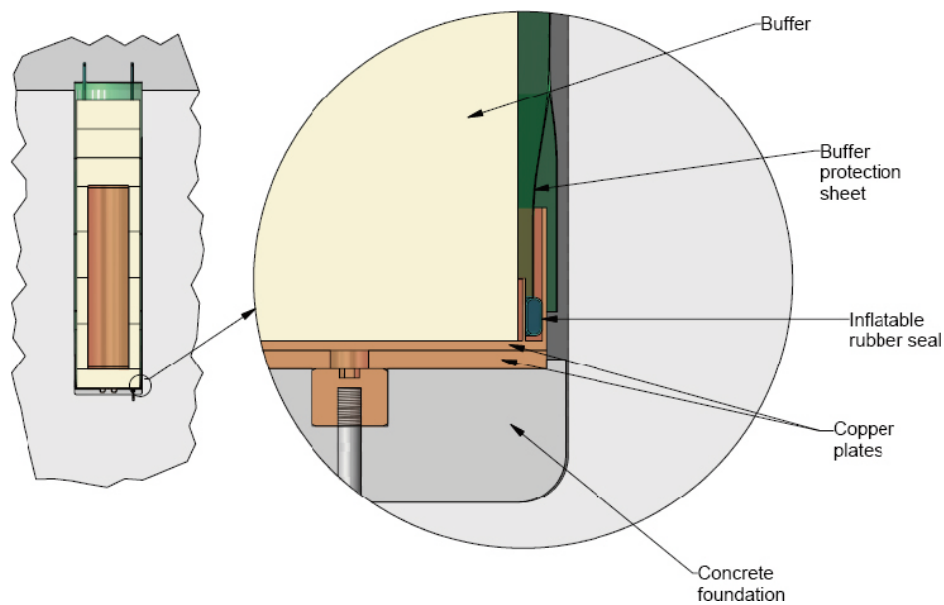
Schematic section of deposition hole in the buffer installation phase. Water is prevented from contacting the buffer block column by a rubber sheet that is tightly fastened to the concrete foundation.
